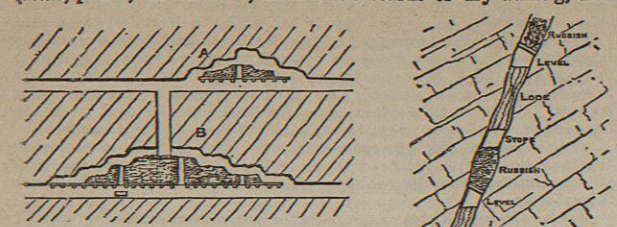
Transverse Section, Dolcoath Mine, Cornwall.
